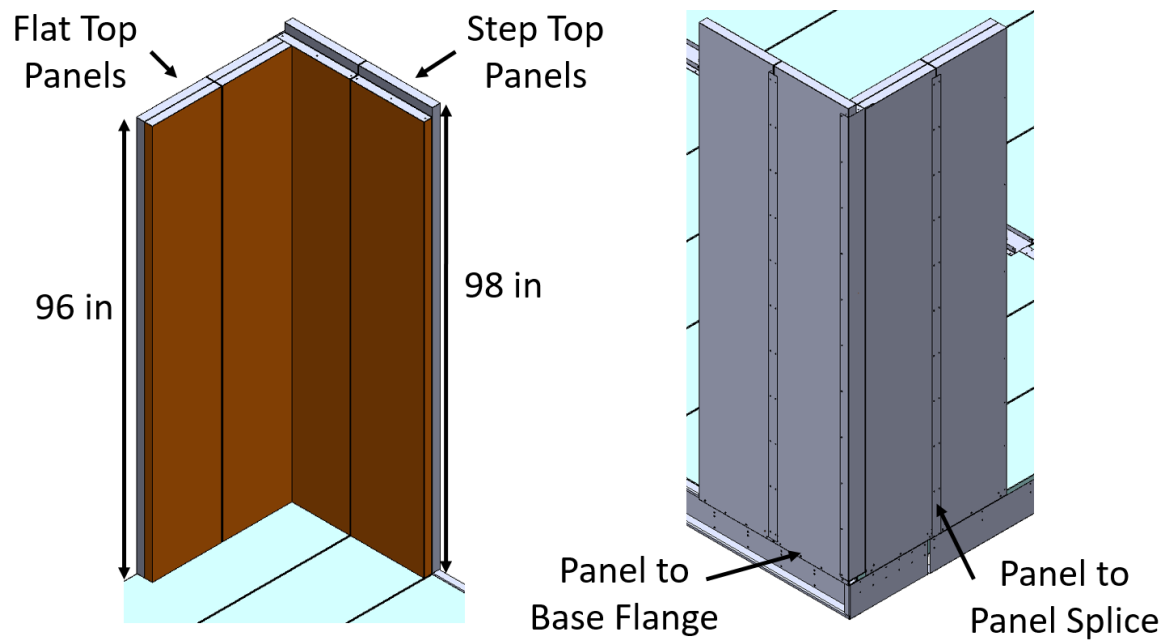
Left: Internal view of external wall corner. Right: External view of external wall corner.
